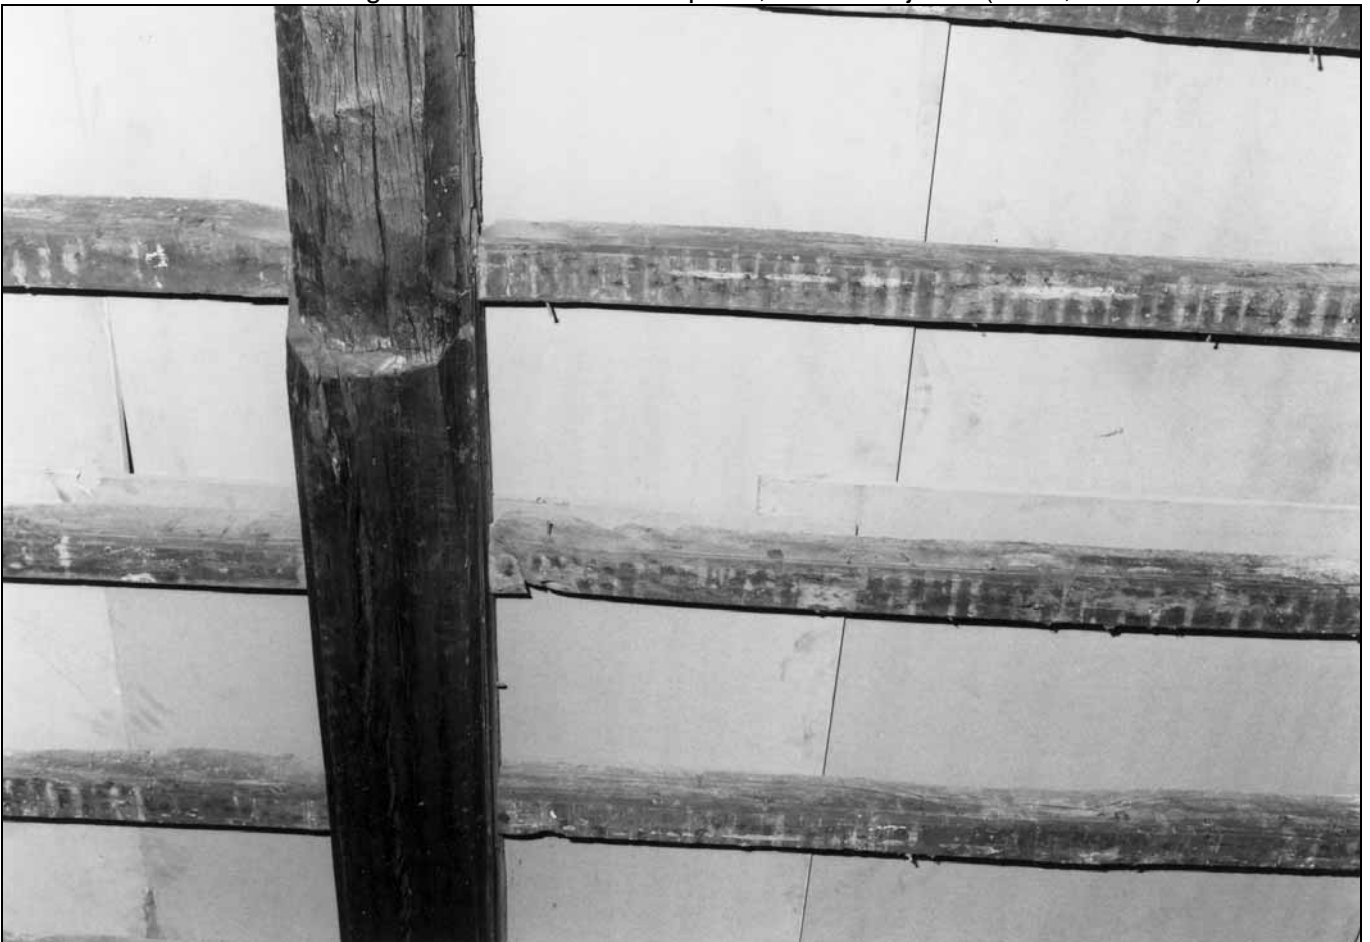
East ceiling beam above 1726 fireplace, with scarf joint, and original, moulded joists (film 4, frame 6)
